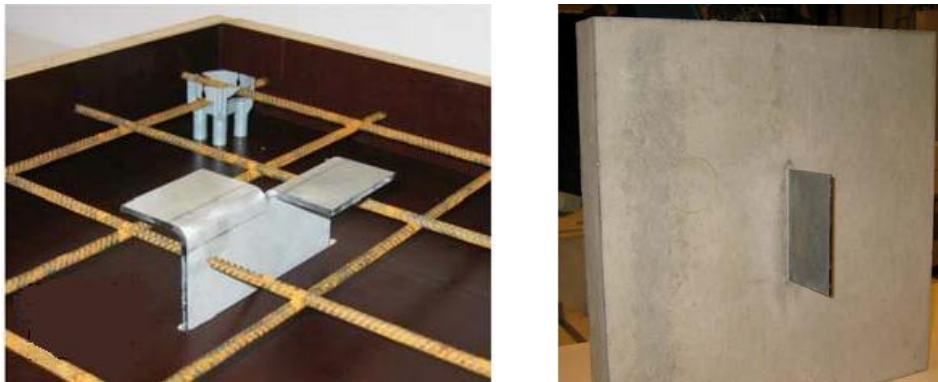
Epoxy-glued folded steel plate (GSP) the moulding forms on the left. Prefabricated slab with inserted shear connector on the right, see [1].
